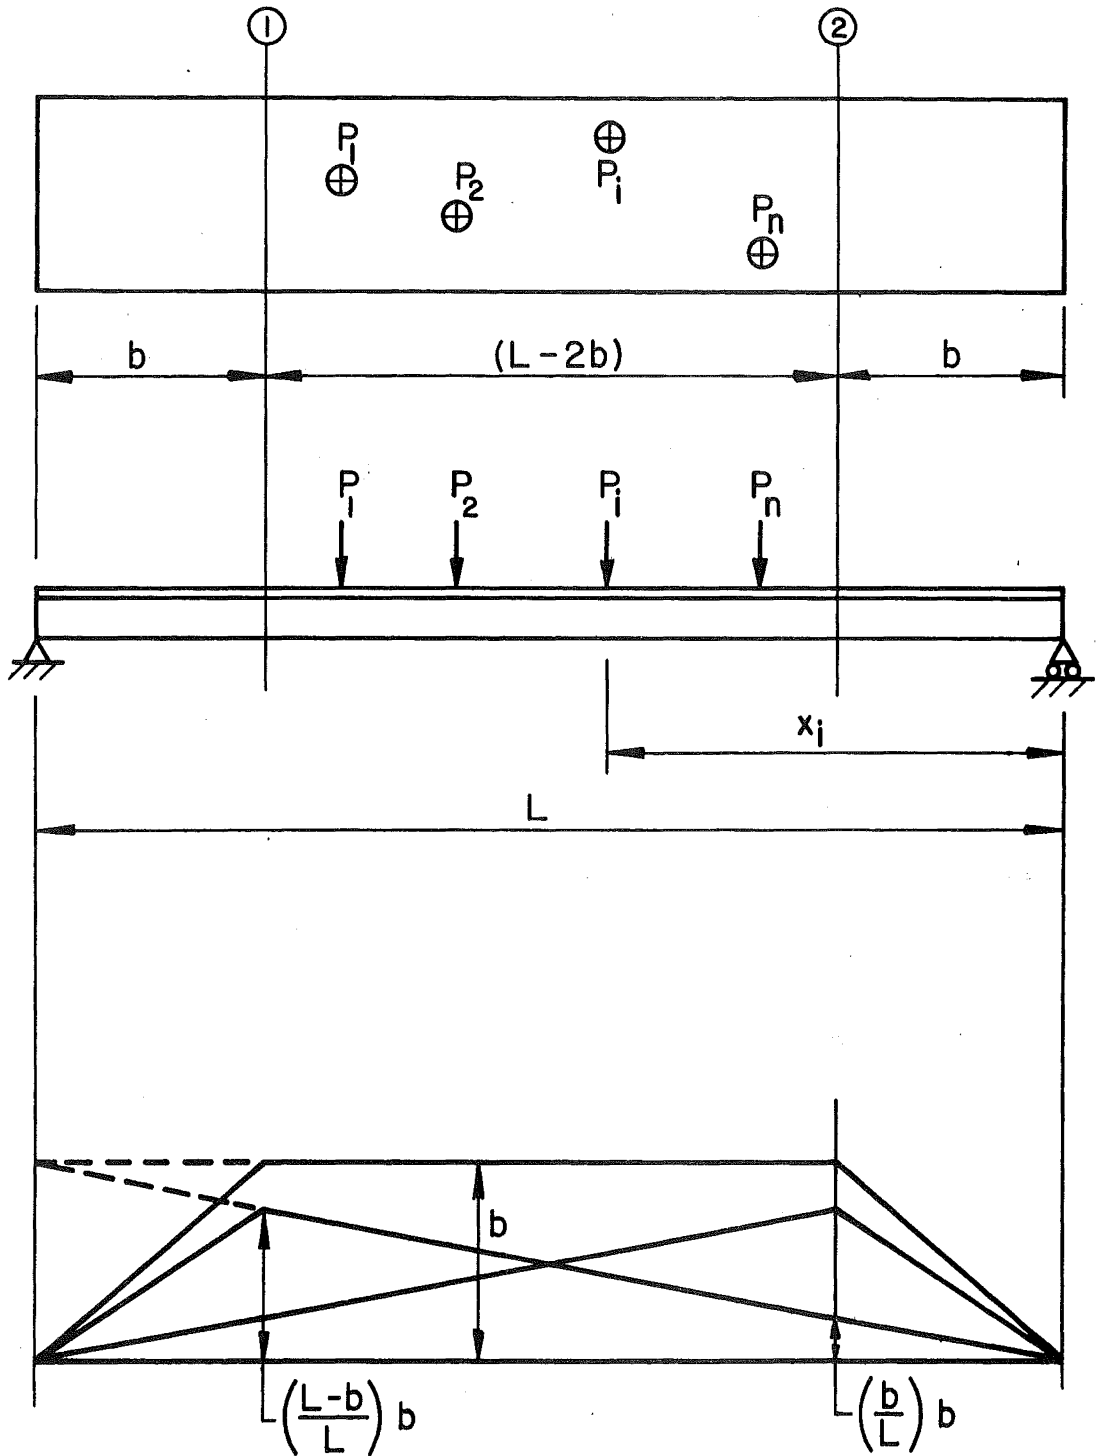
Schematic of a Simple, Right (Non-Skew), Multiple Girder Bridge Span and Influence Lines for Bending Moment at Cross-Sections 1 and 2.
